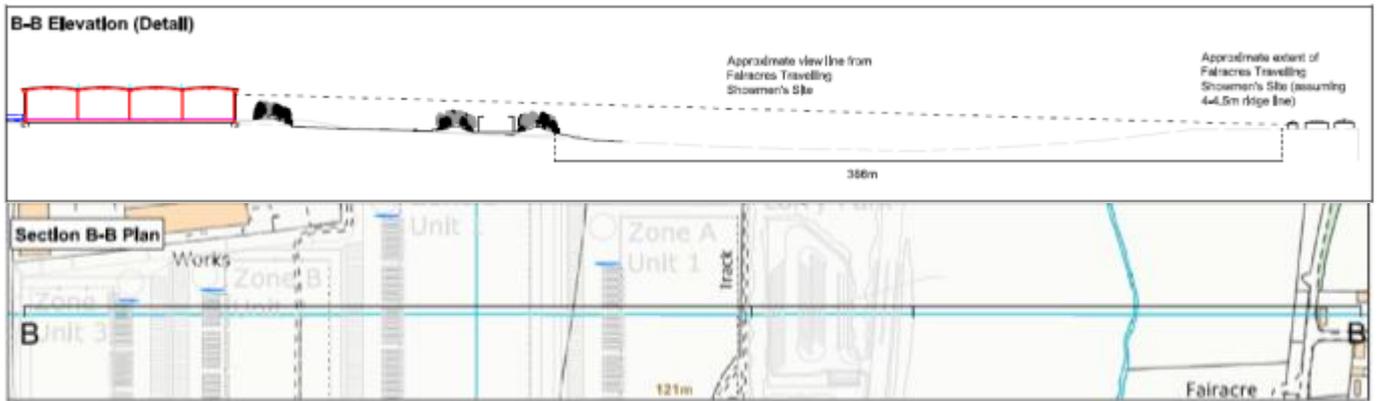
Cross Section indicating relationship between Fairacres, the development and the structural planting
